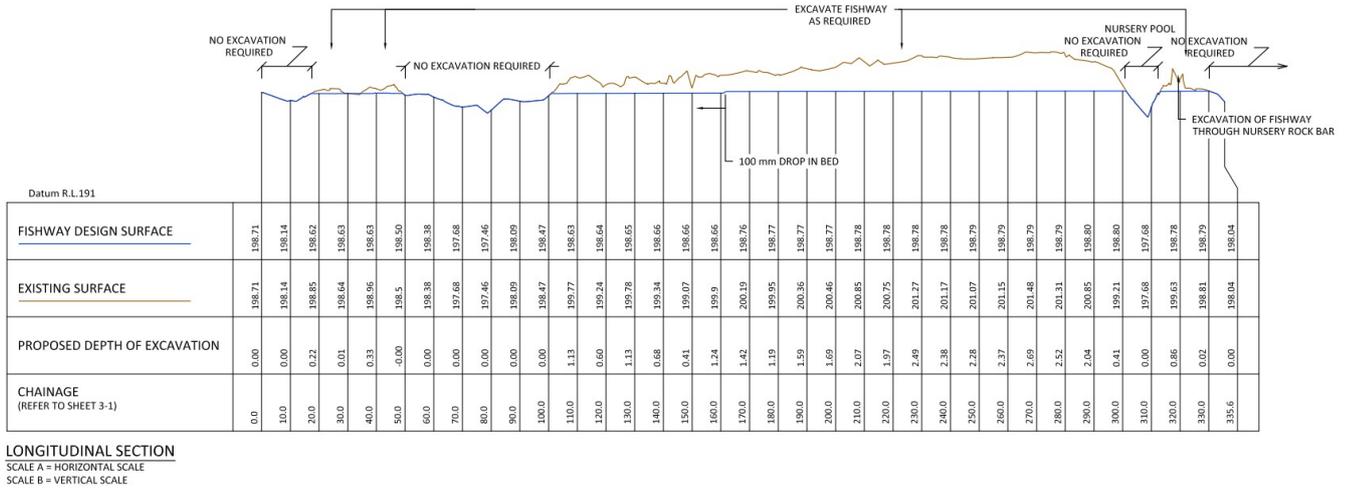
Horseshoe Bend fishway longitudinal section showing cut through rock bars
